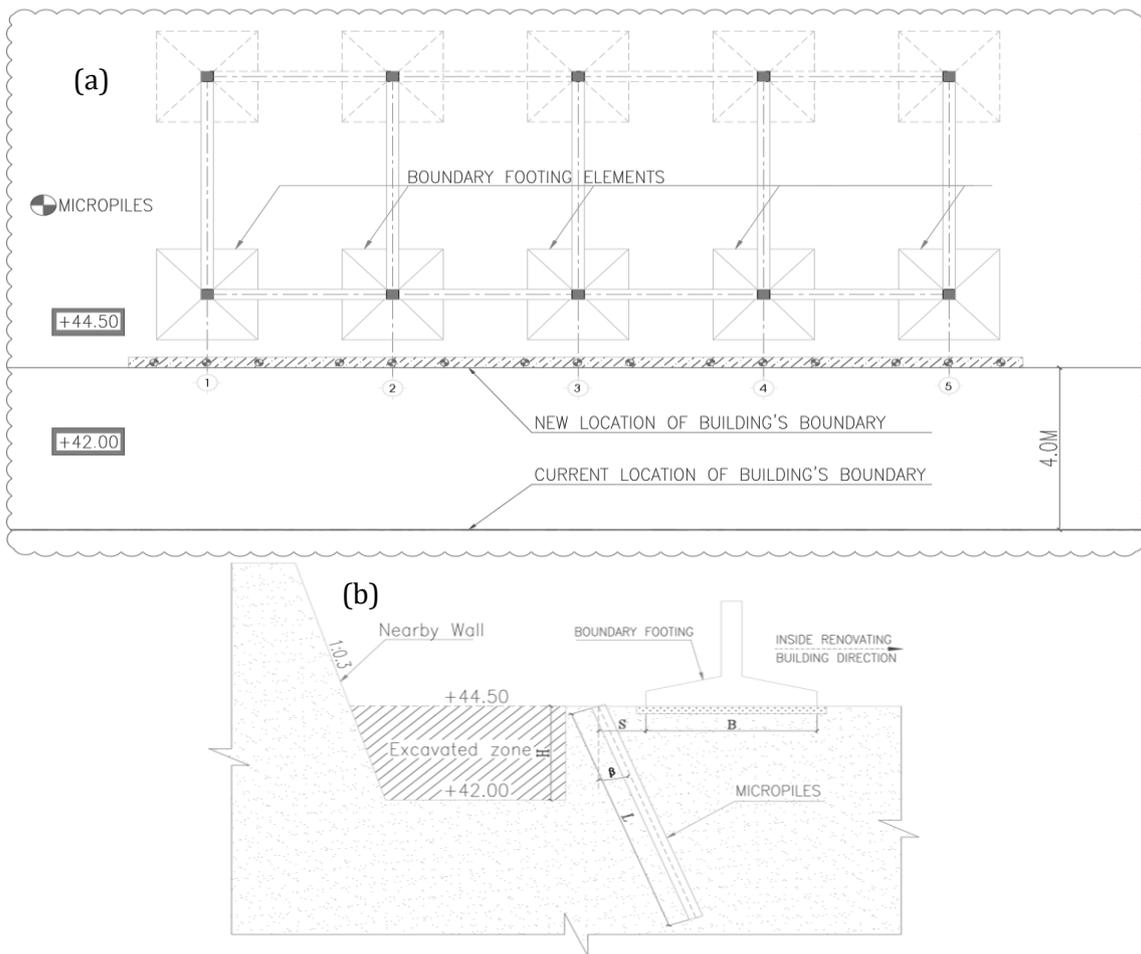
(a) Layout plan of foundation; (b) Cross-section of boundary footing after strengthened.
